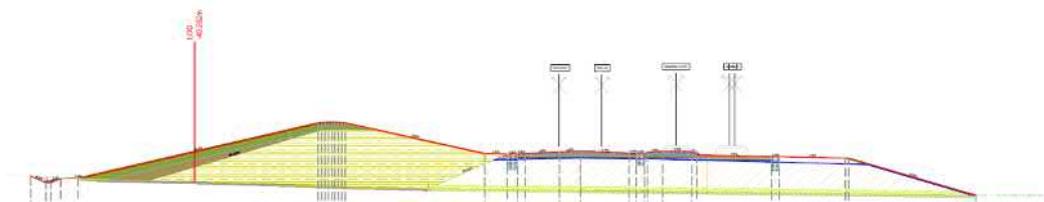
Cross Section of Twyford Embankment at Ch.HS2 81+540
